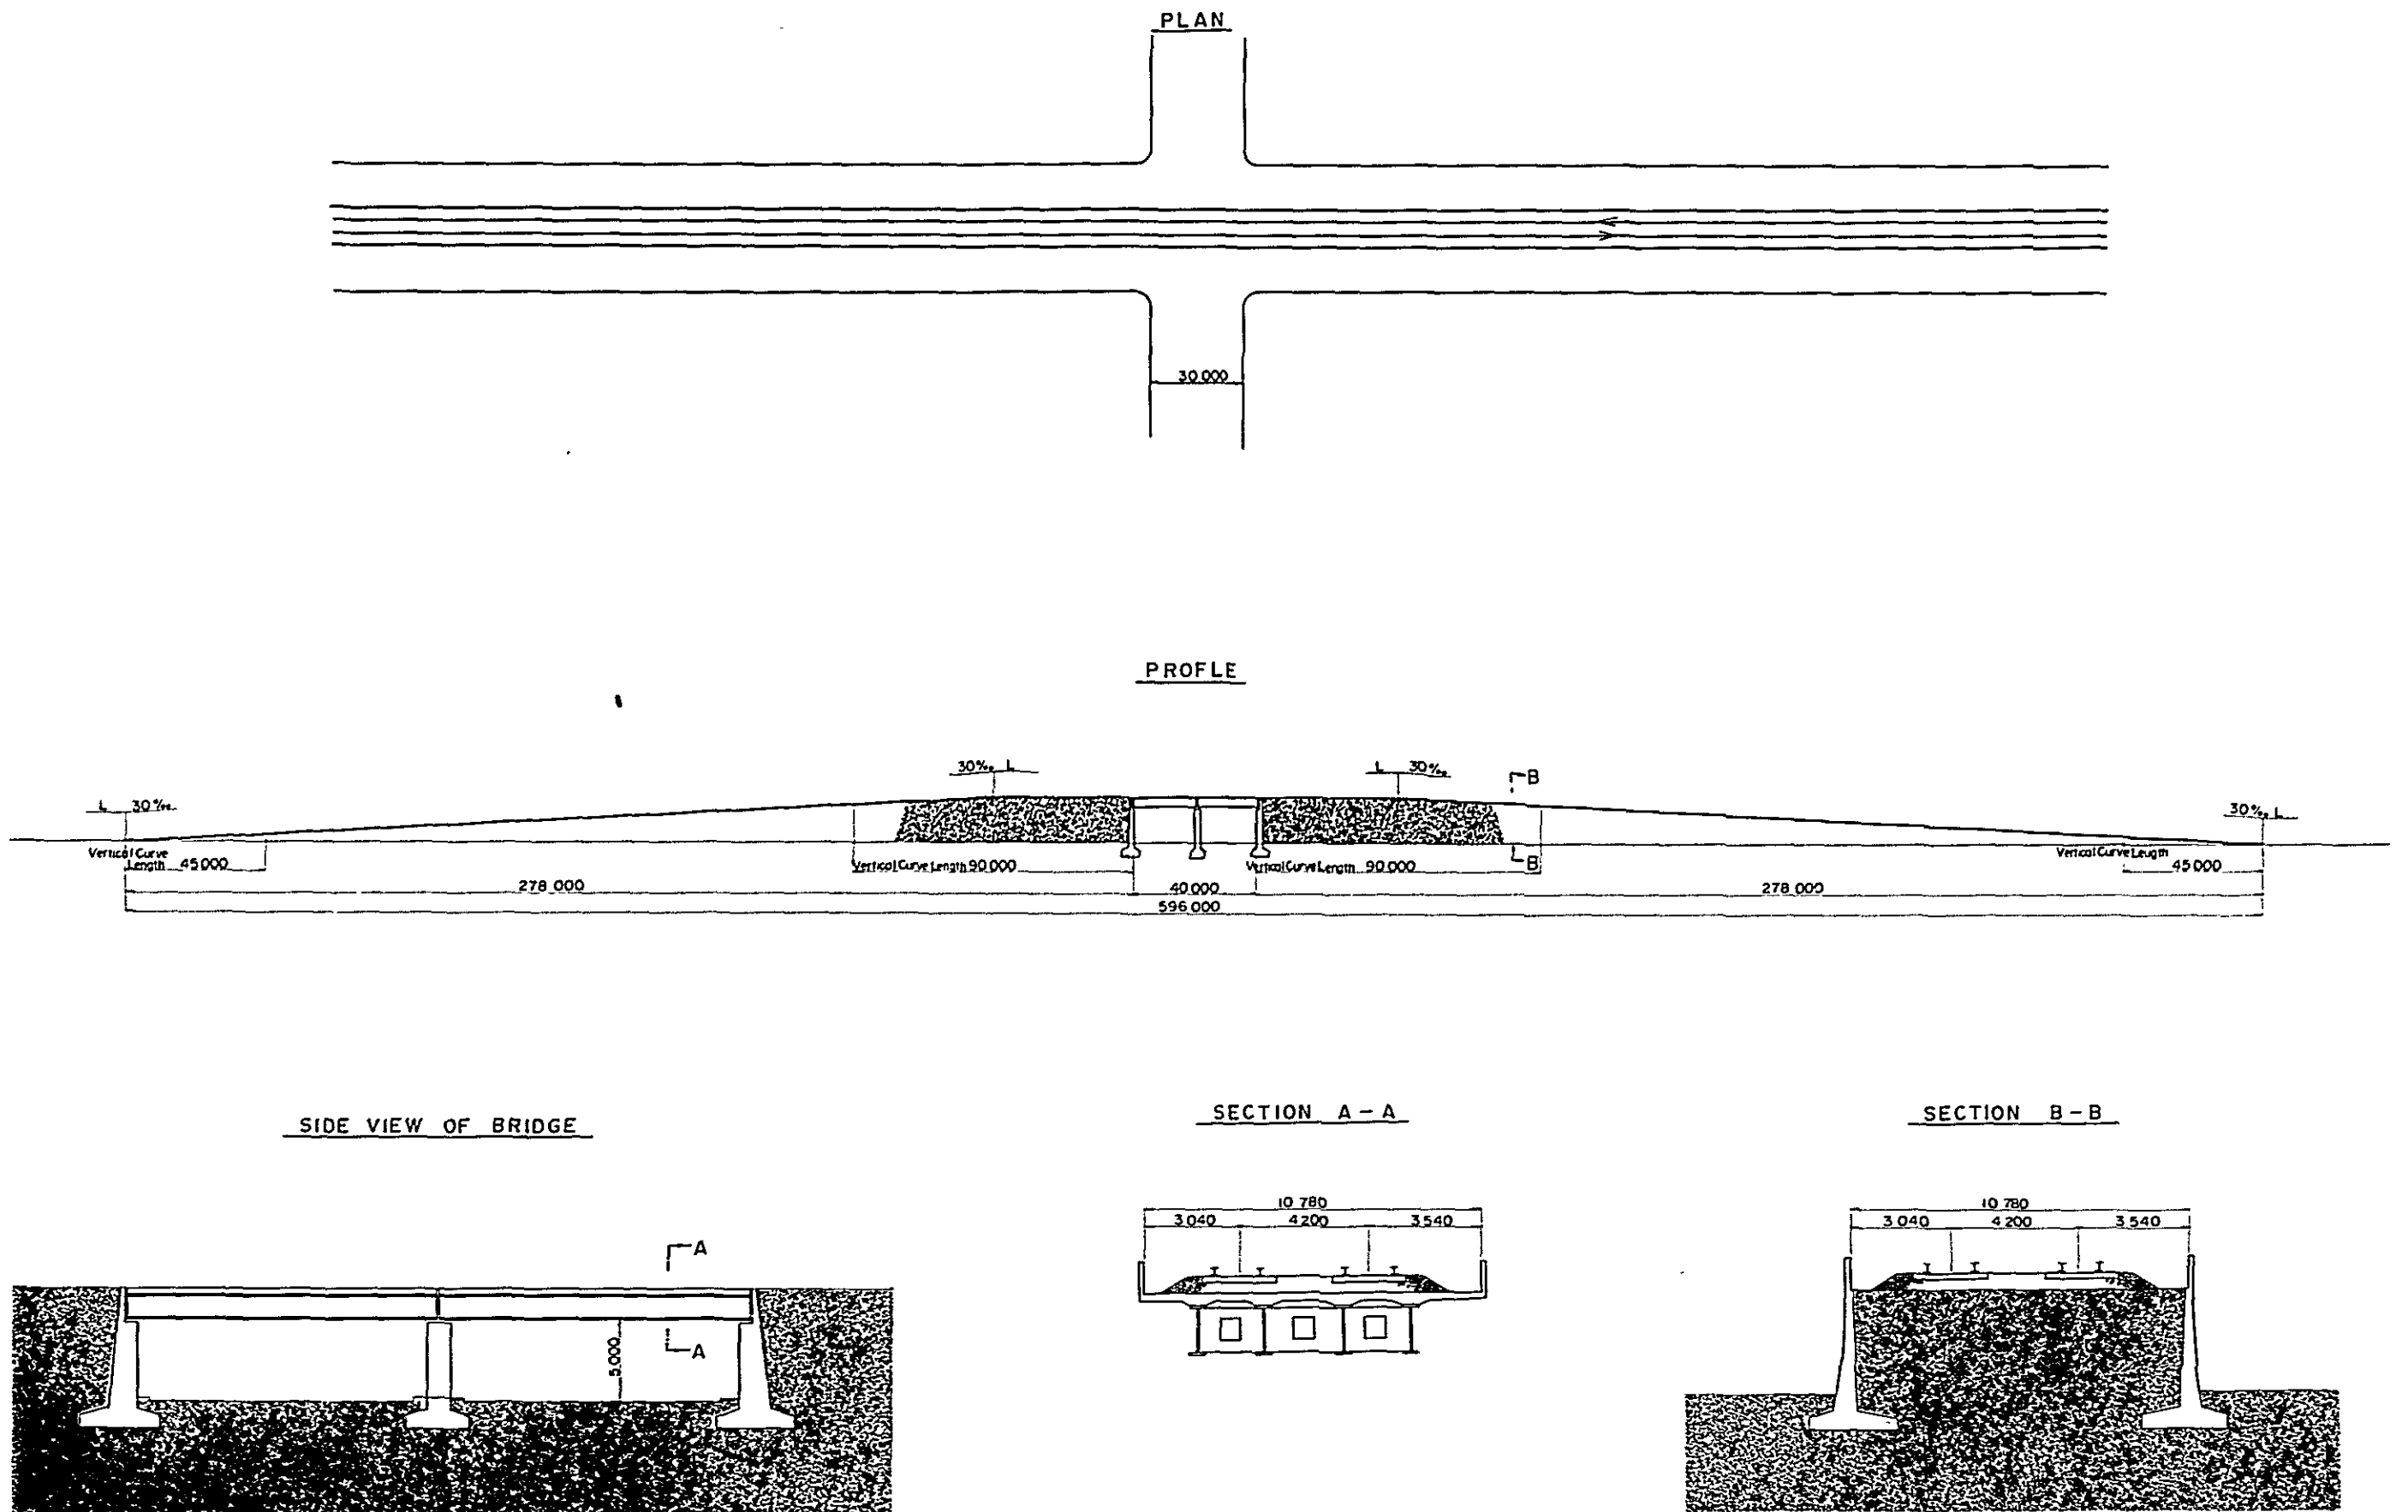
Grade Separated Crossing (Railway Crossing Over Road) Unit: mm
